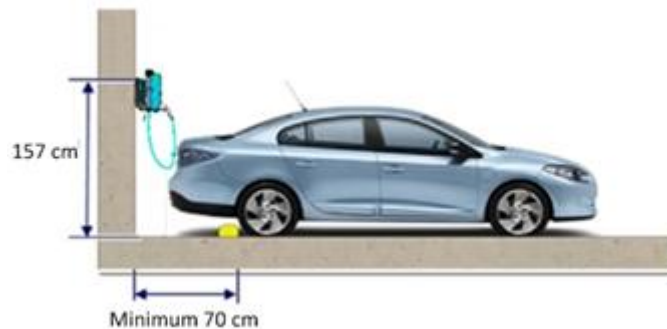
Height and Distance Requirements for Single Socket Rear Wall CS Installation
